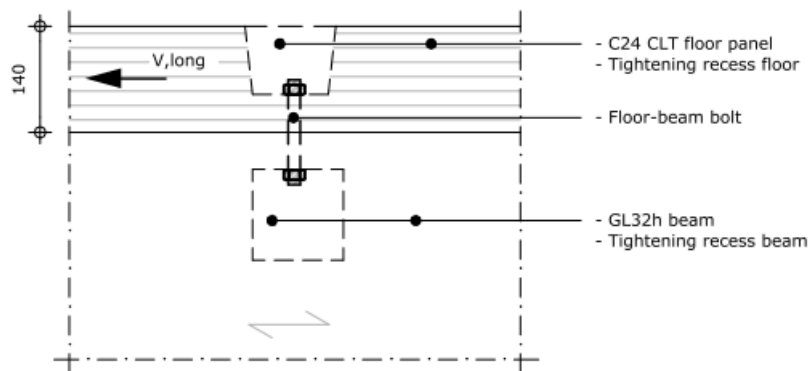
Cross-section D-D of Figure 10-7 floor-to-beam connection longitudinal diaphragm shear force in mm
